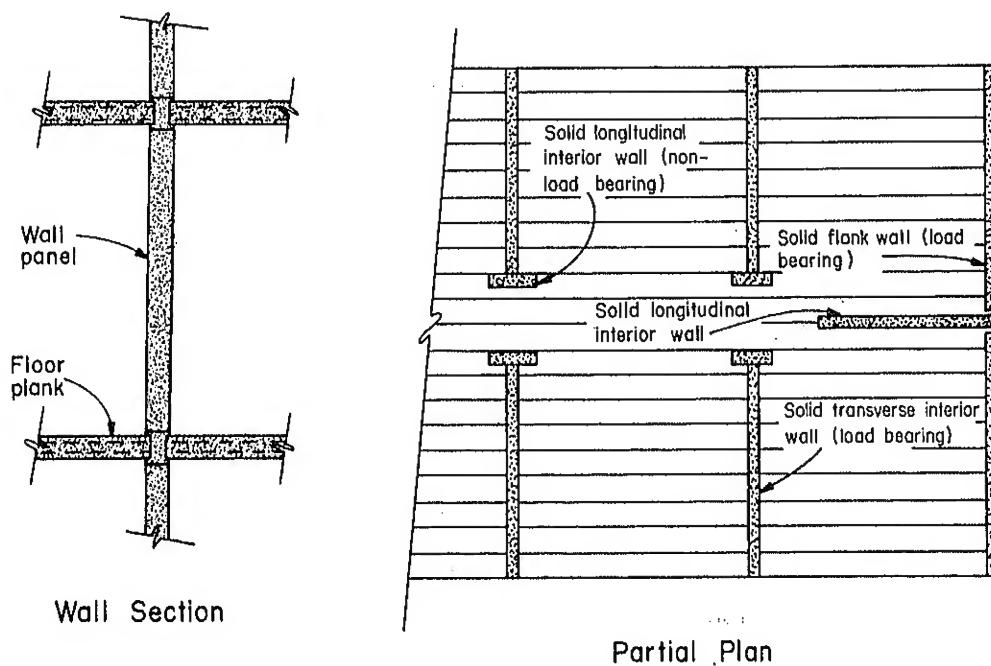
Large Panel Building Showing Structural Wall Panels in Plan and Section
